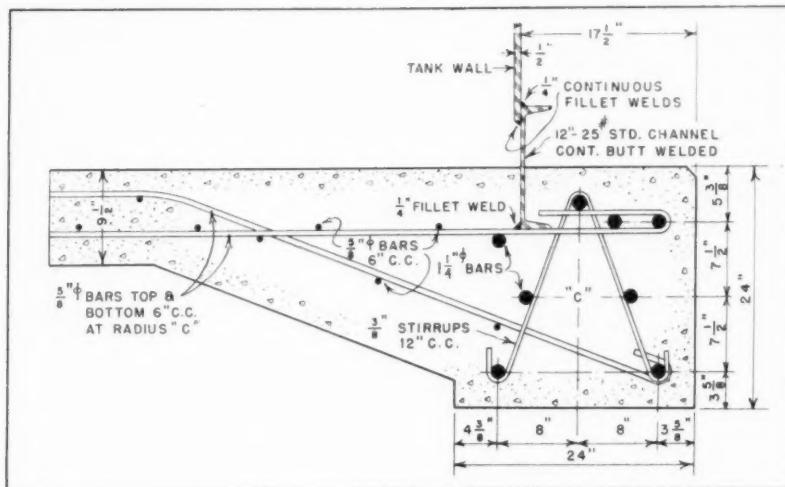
Detail of Concrete Bottom of Steel Reservoir; showing imbedded structural steel channel
